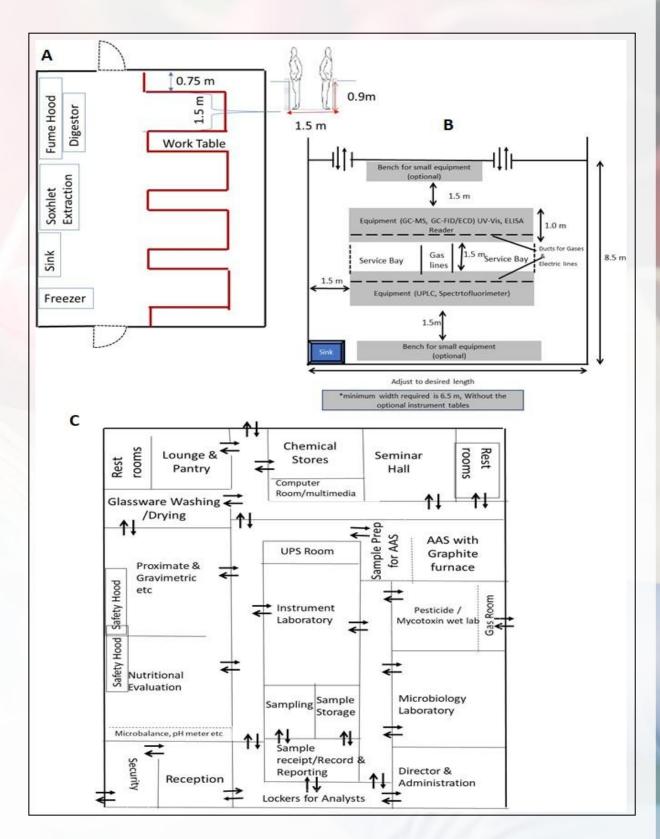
Schematic layout for A) laboratory for eight analysts B) Instrument room and C) Complete Food Testing Laboratory
